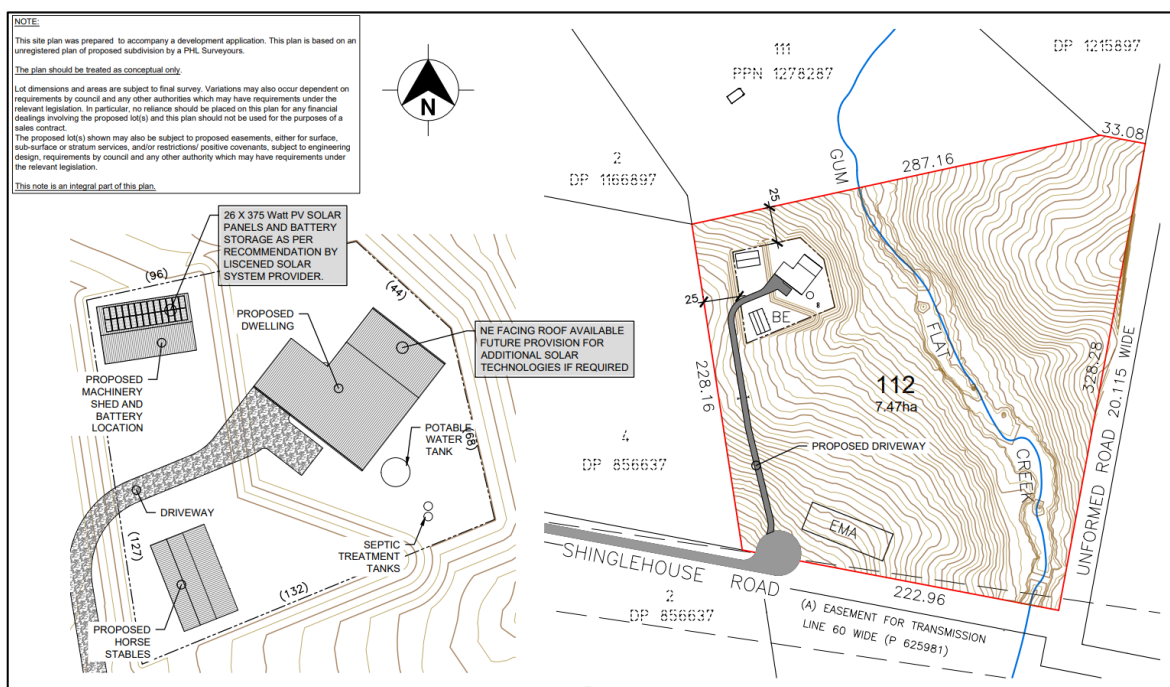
Indicative site plan for proposed Lot 112, showing proposed locations of shed, solar panels and battery
